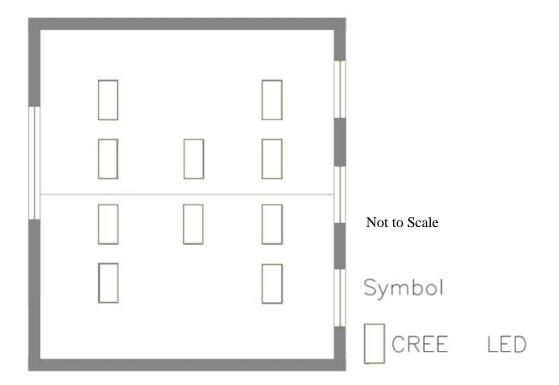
Initial Reflected Ceiling Plan of Activity Room
